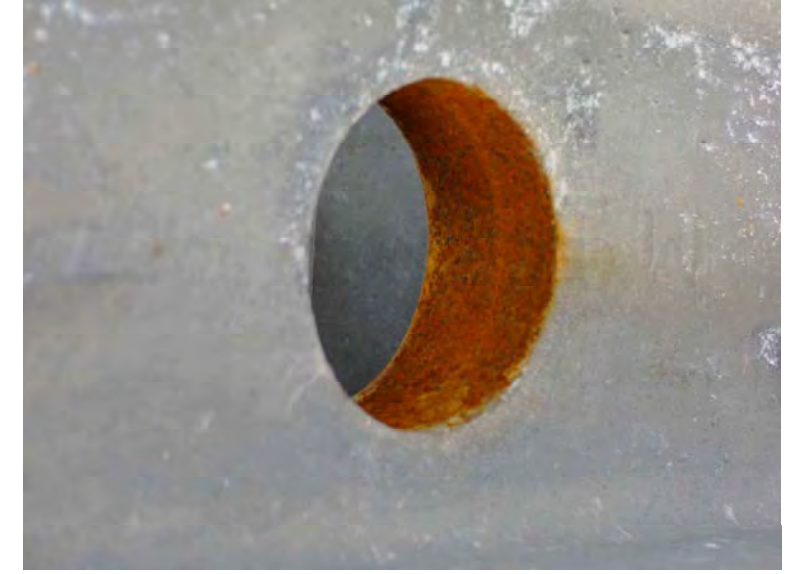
Rust discolouration already showing in most of the holes in the upper and lower cross rails of the Mabey bridge.
